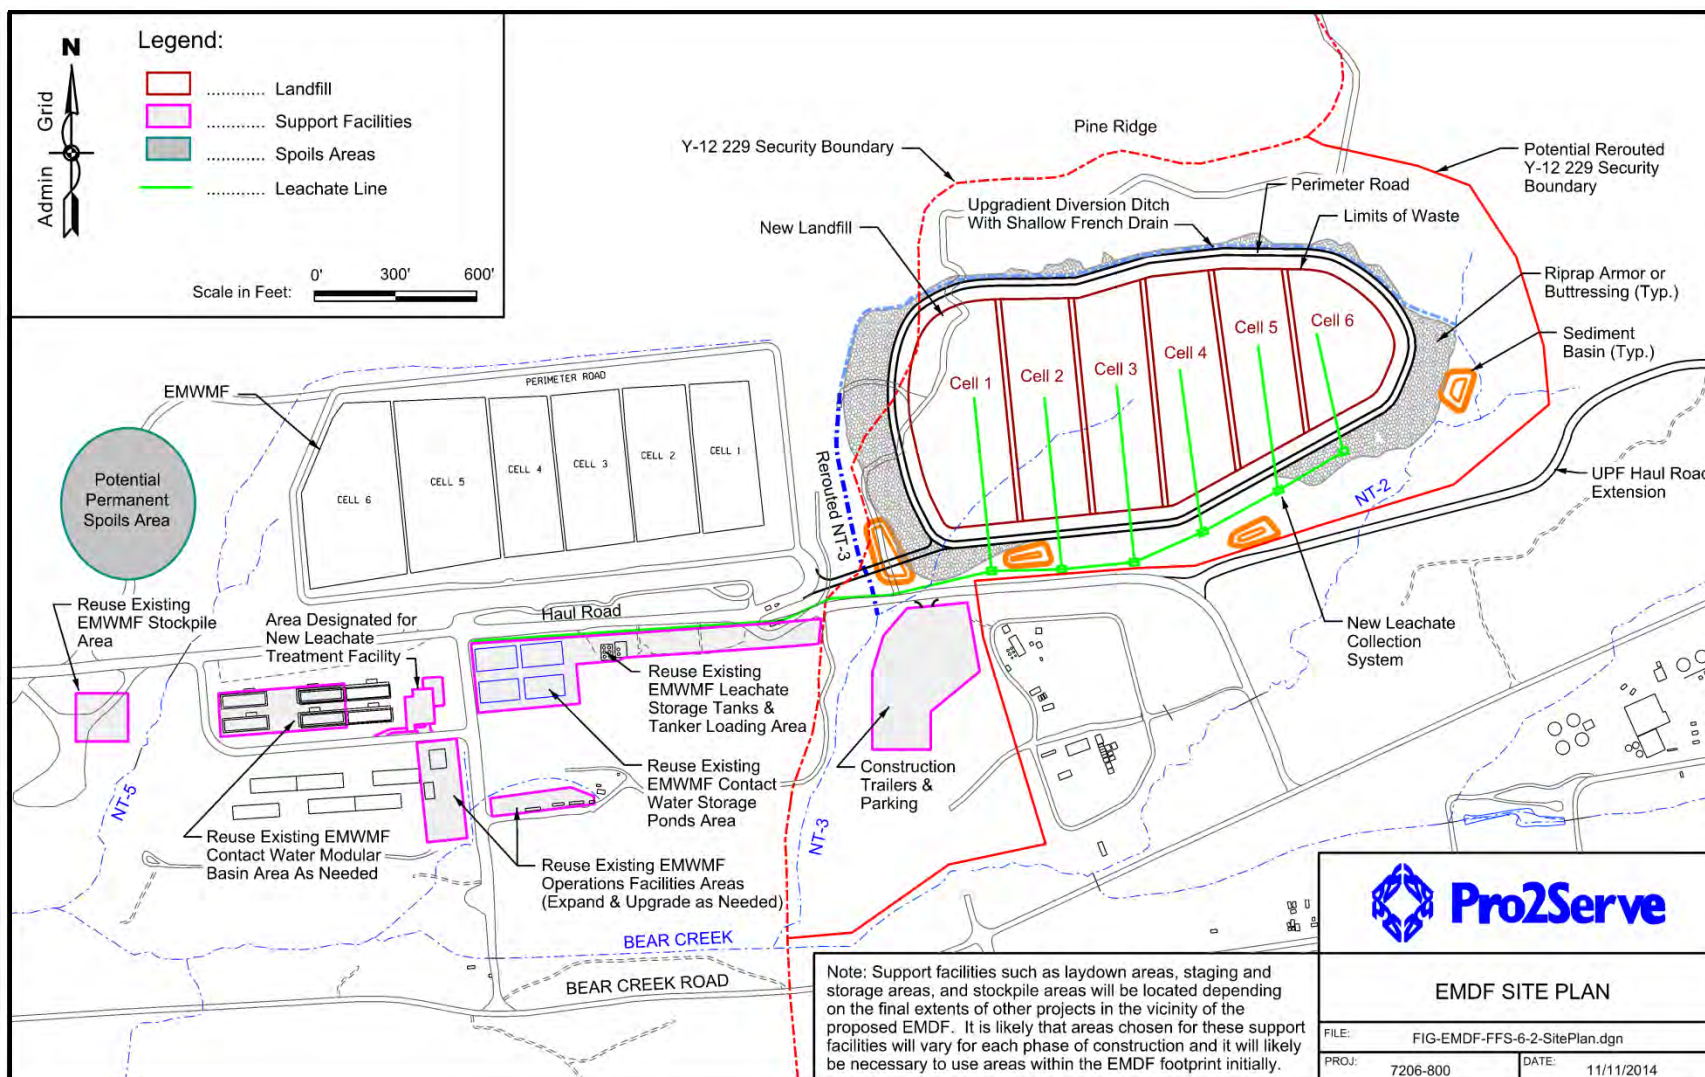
On-site EMDF Conceptual Site Layout Plan at EBCV Site
